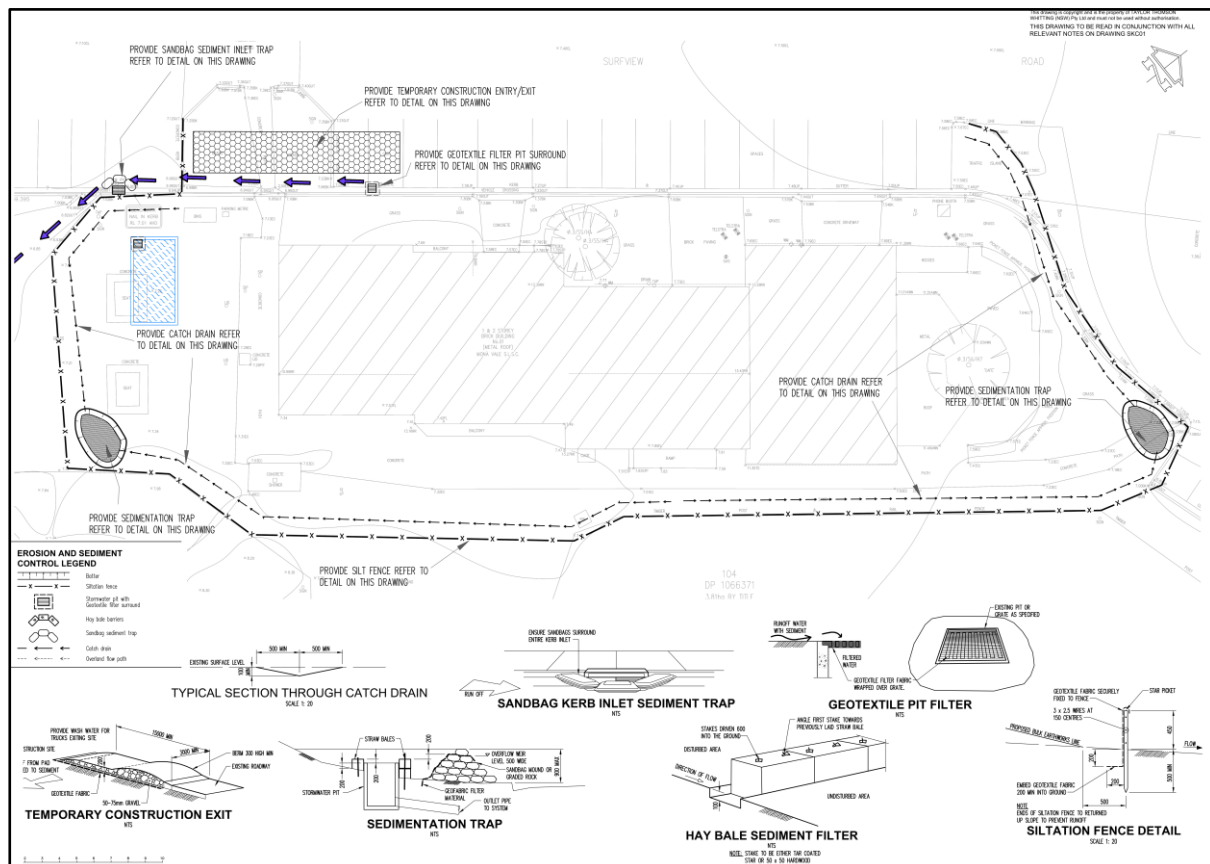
Extract of SKC102 Erosion and Sediment Control Plan
